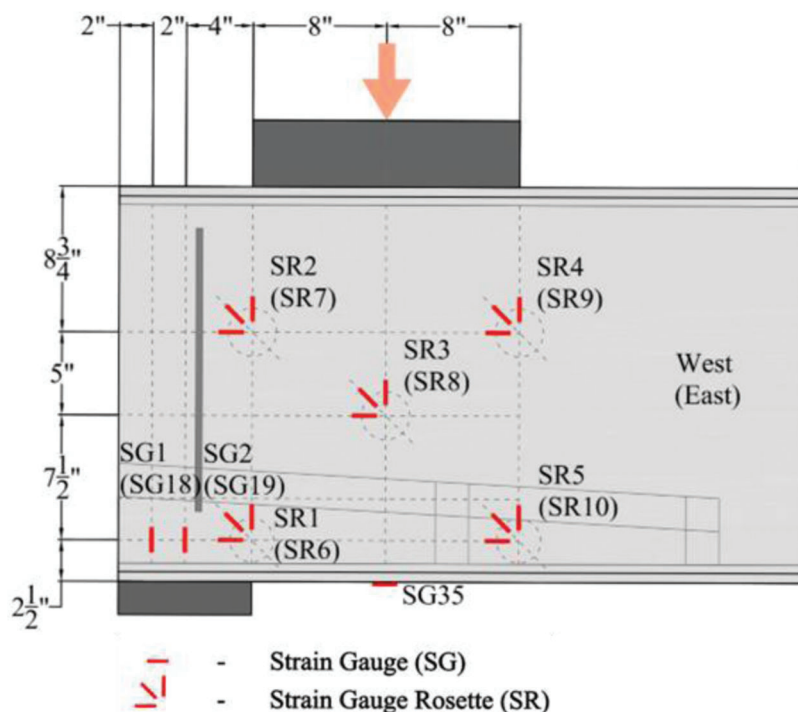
Strain gauge layout (side elevation): Specimen 2.
